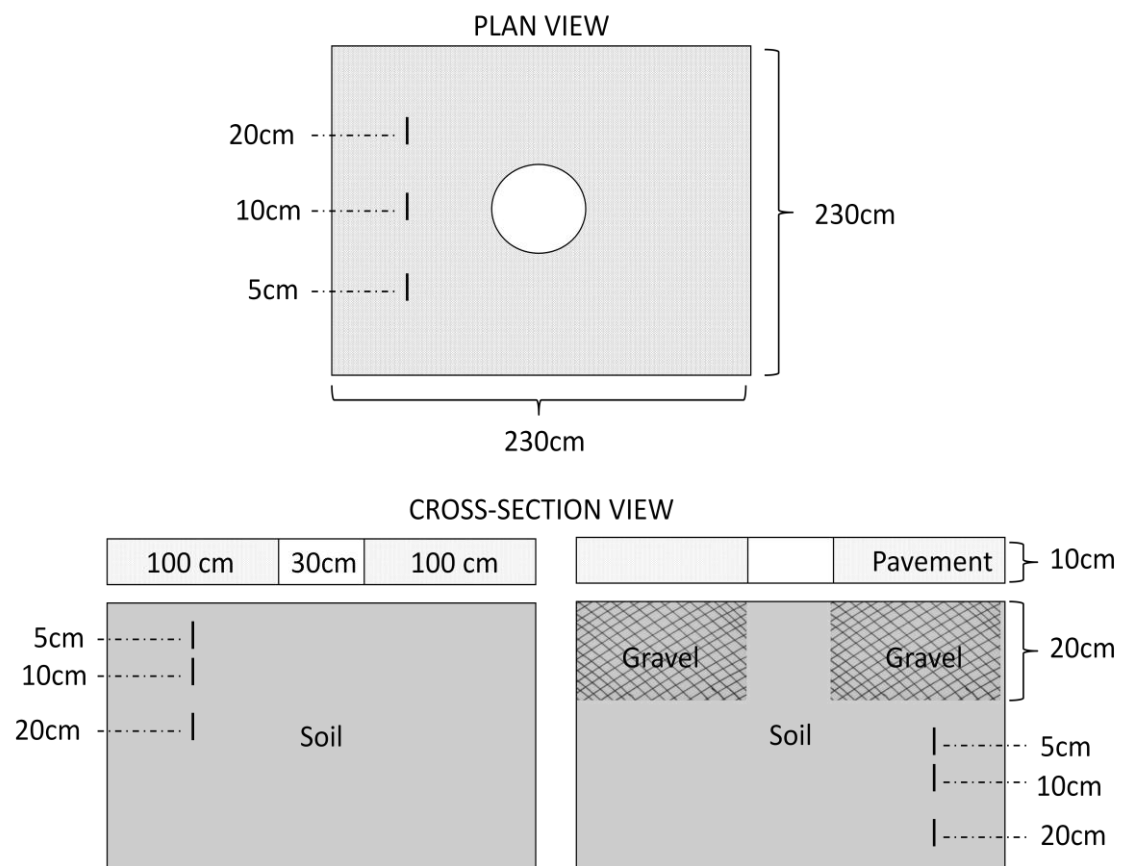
Plan and cross-sectional view of plot designs for pavement treatments with and without a gravel subbase. Soil moisture sensors are located at 5 cm, 10 cm, or 20 cm beneath the pavement, or gravel depending on the treatment.
